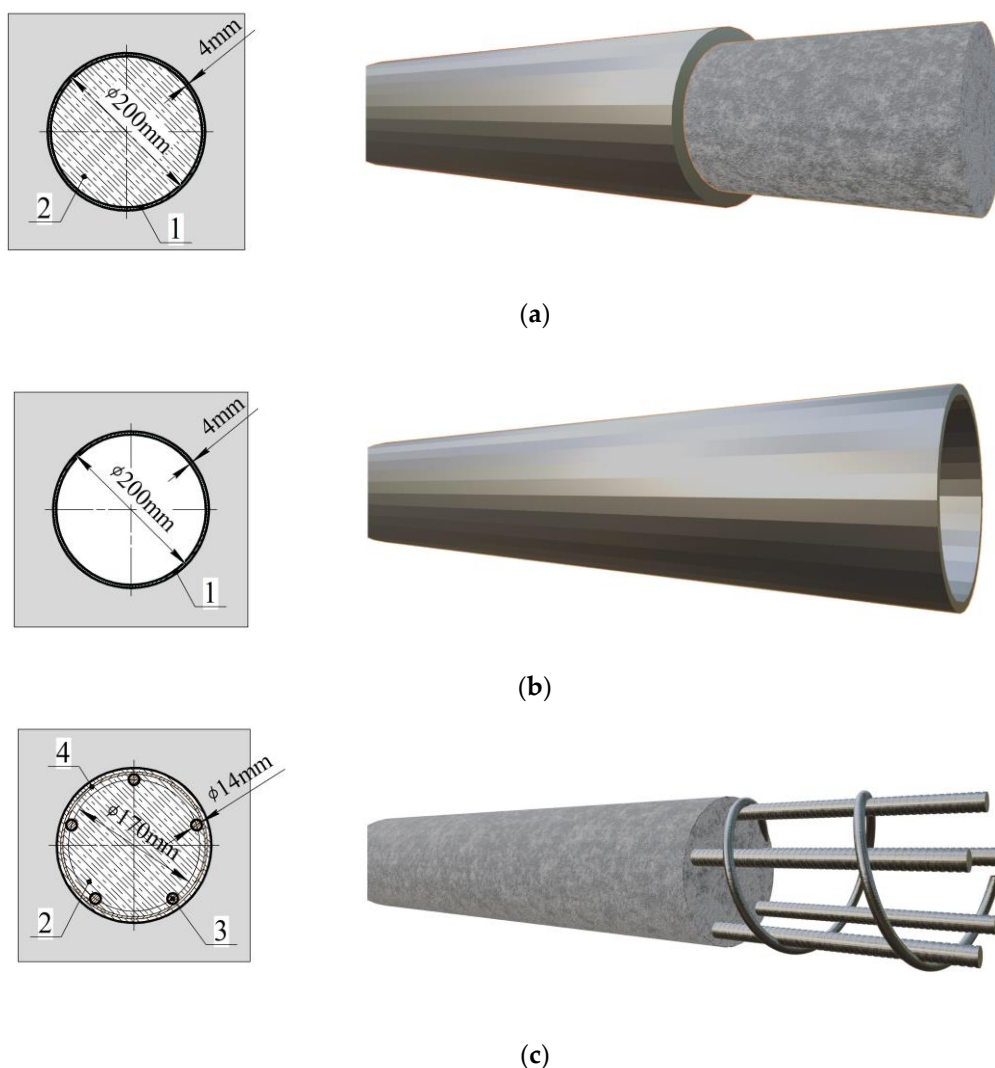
Pile design in numerical simulation: (a) steel pile; (b) steel tube; (c) filling pile. 1—steel tube (diameter 200 mm); 2—concrete; 3—main steel bars (5×14 mm); 4—lateral reinforcement stirrups (spiral length 14 m, diameter 6 mm).
